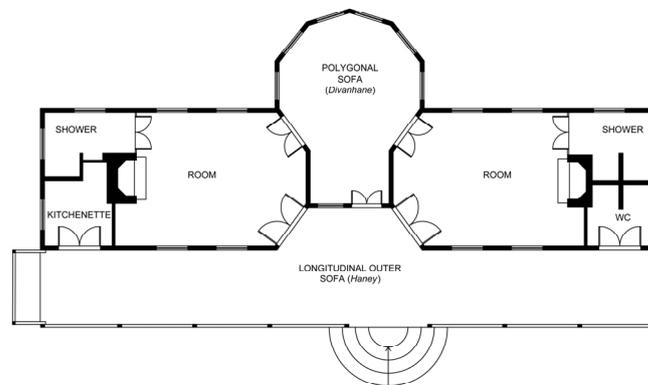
Plan of Nail Cakirhan House (by Nail Cakirhan) in Akyaka. Drawing by author.
